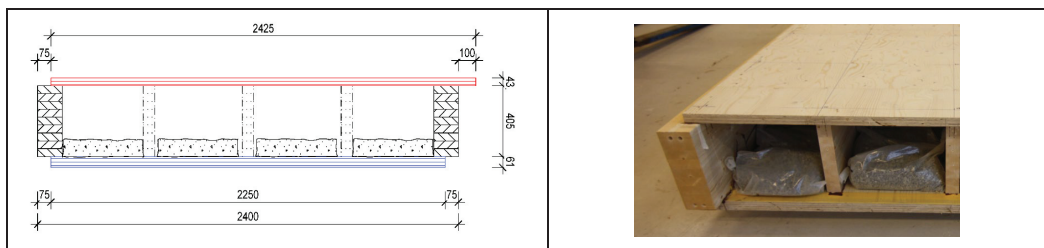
Floor element cross section (left) and picture showing the gravel bags positioned in the element cavity (right).
